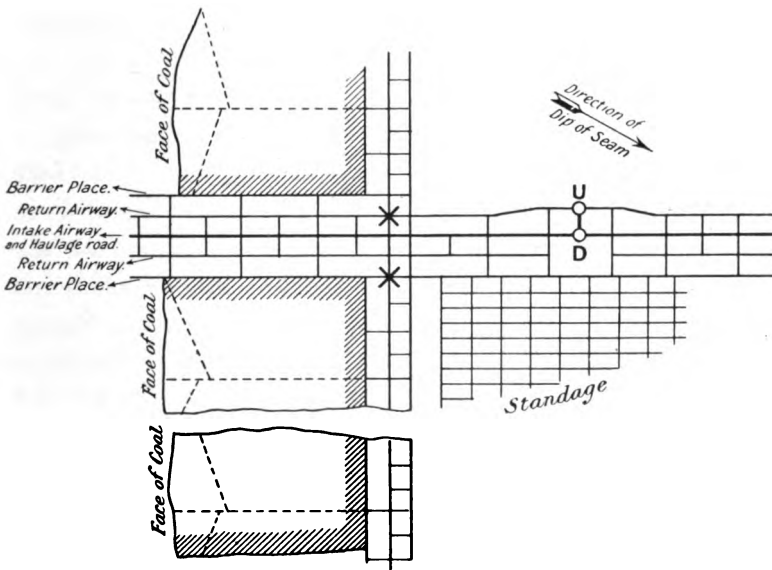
Portion of a Plan of a Seam worked by Long-wall, the Main Roads protected by Pillars of Coal.
